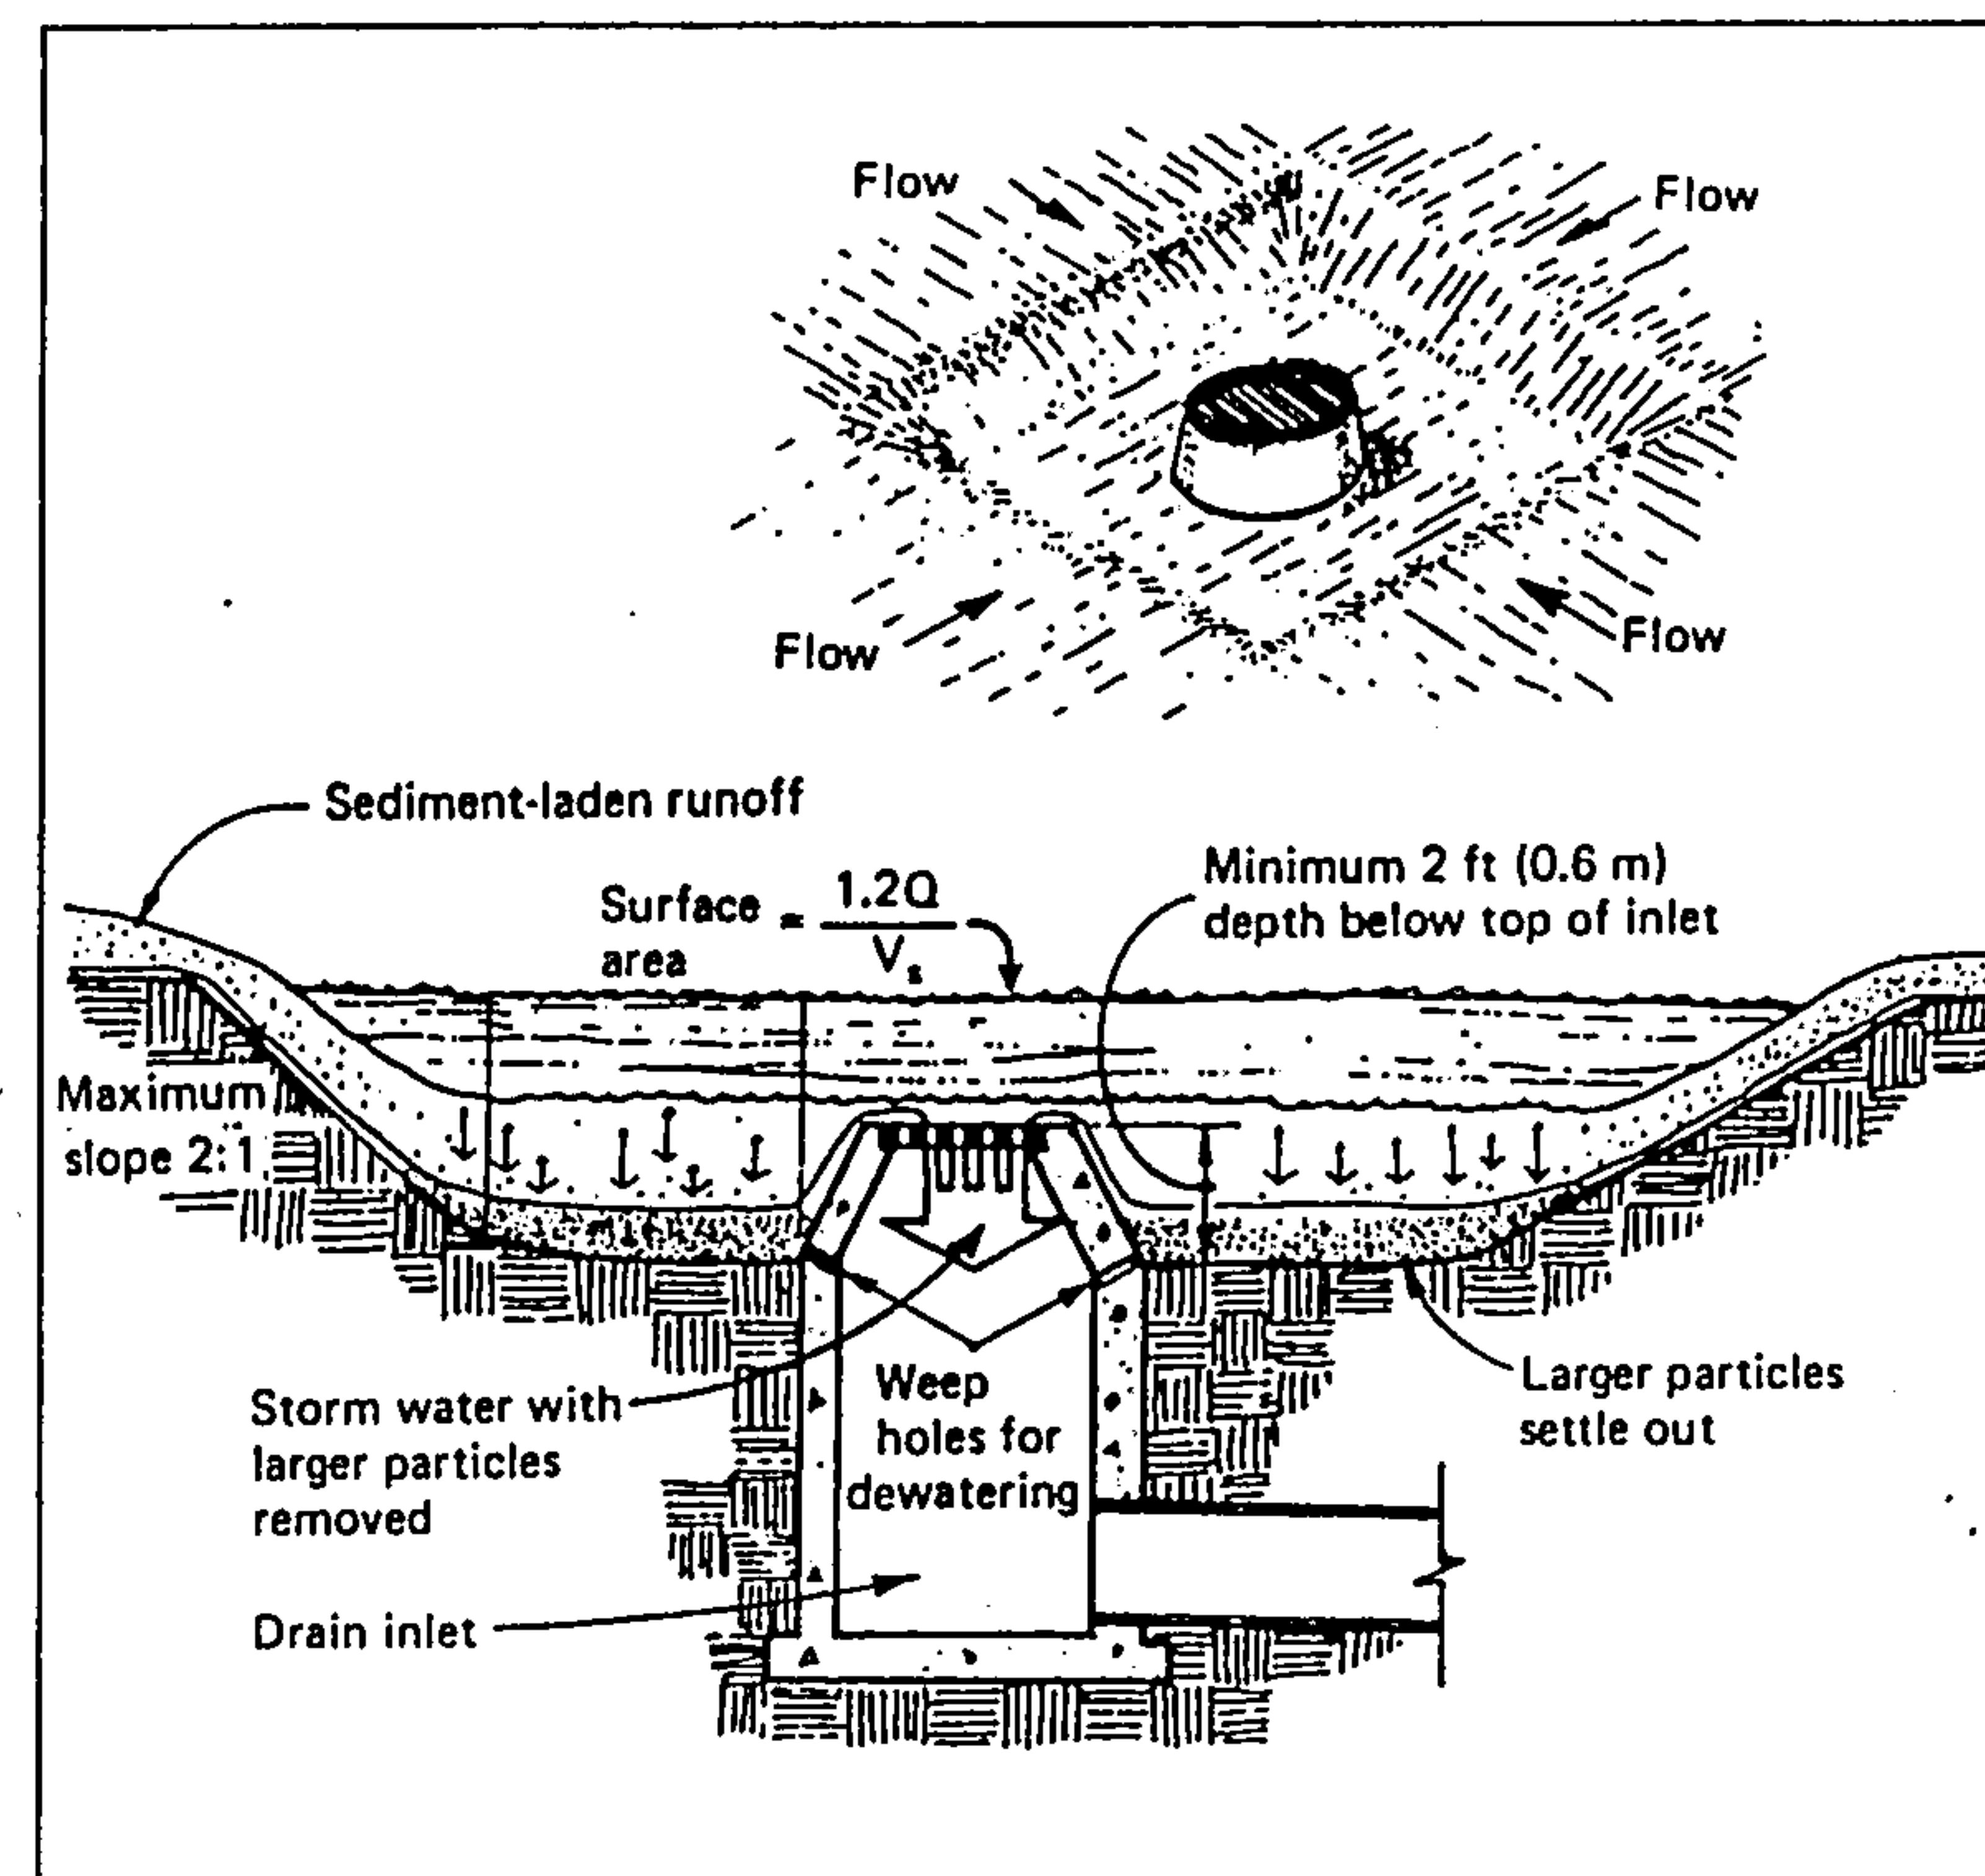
Sample drawing: excavated sediment trap with storm drain inlet as outlet. (Adapted from 11)
